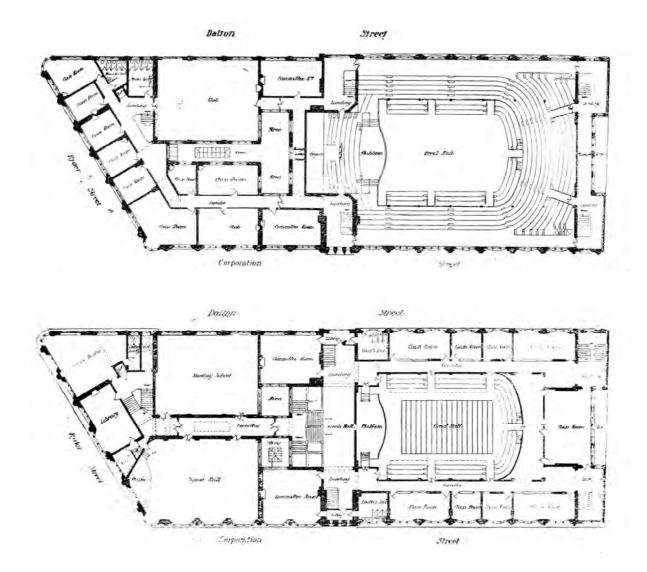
Birmingham Central Hall. First (bottom) and second (top) floor plans. Source: BNEJ 1905.
